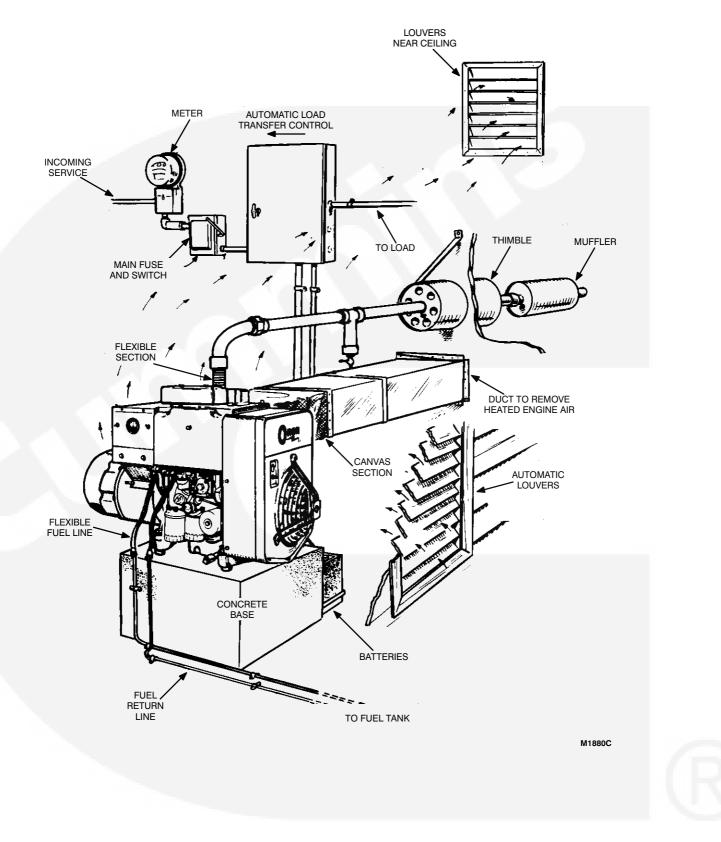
DJE, TYPICAL INSTALLATION
